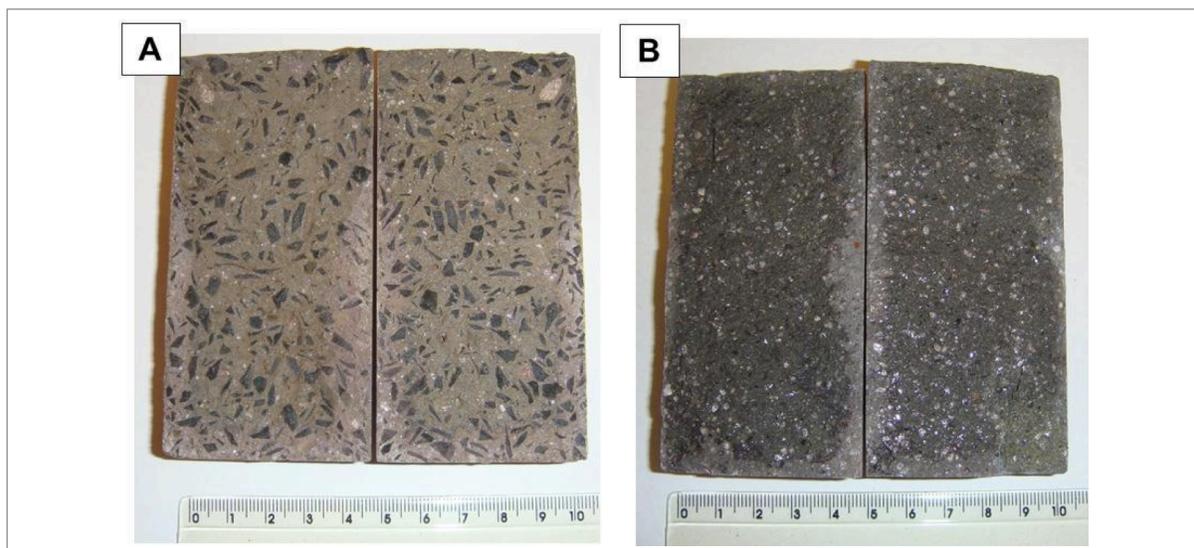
Fractured specimens after spraying with silver nitrate solution: (A) reference concrete (REF); (B) new concrete (0.26)
